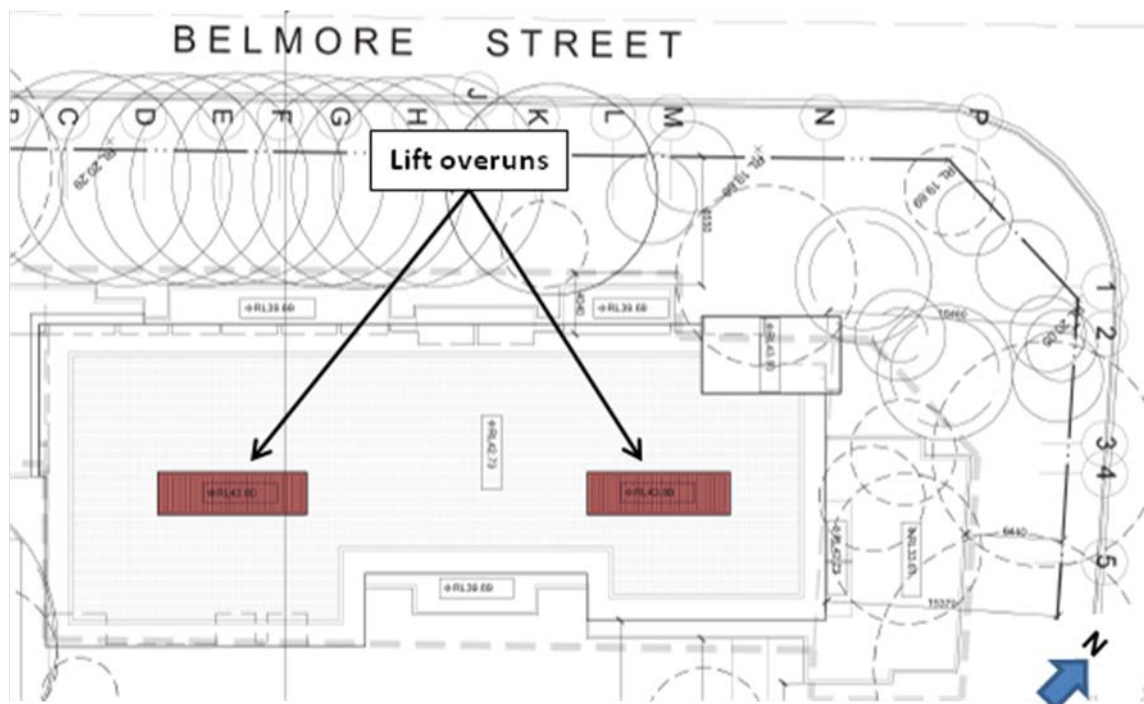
Location of lift overruns for Building B (Source: Proponent's Environmental Assessment).
